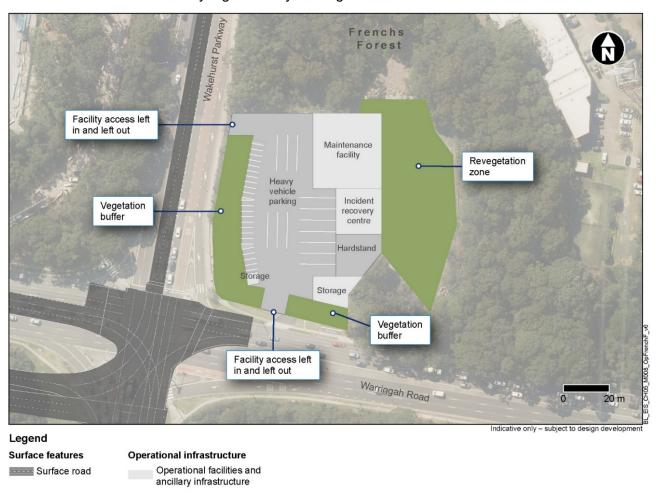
Tunnel support facilities at the Wakehurst Parkway in Frenchs Forest
